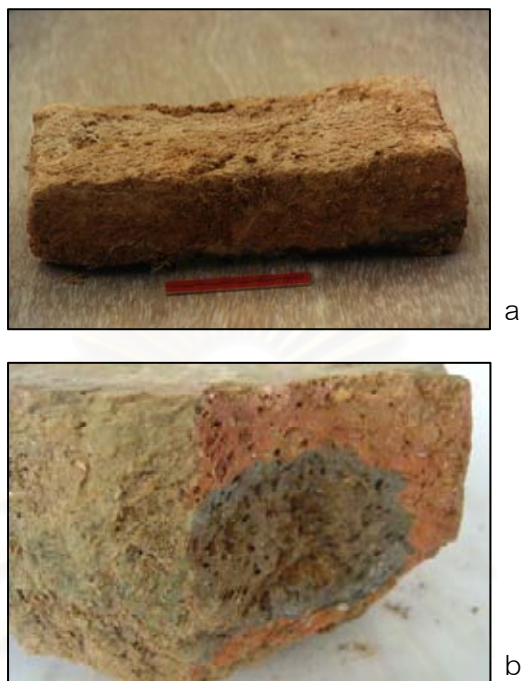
A typical Dvaravati brick sample from Thungsetthi monument:
